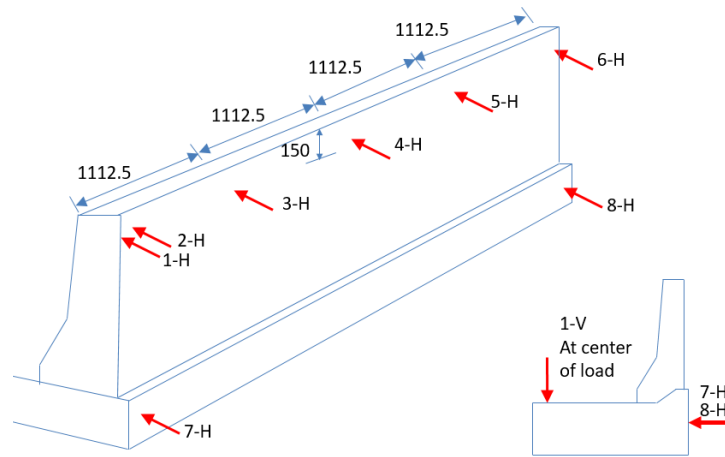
Arrangement of potentiometers (LVDTs and POTs) in specimen S-1
